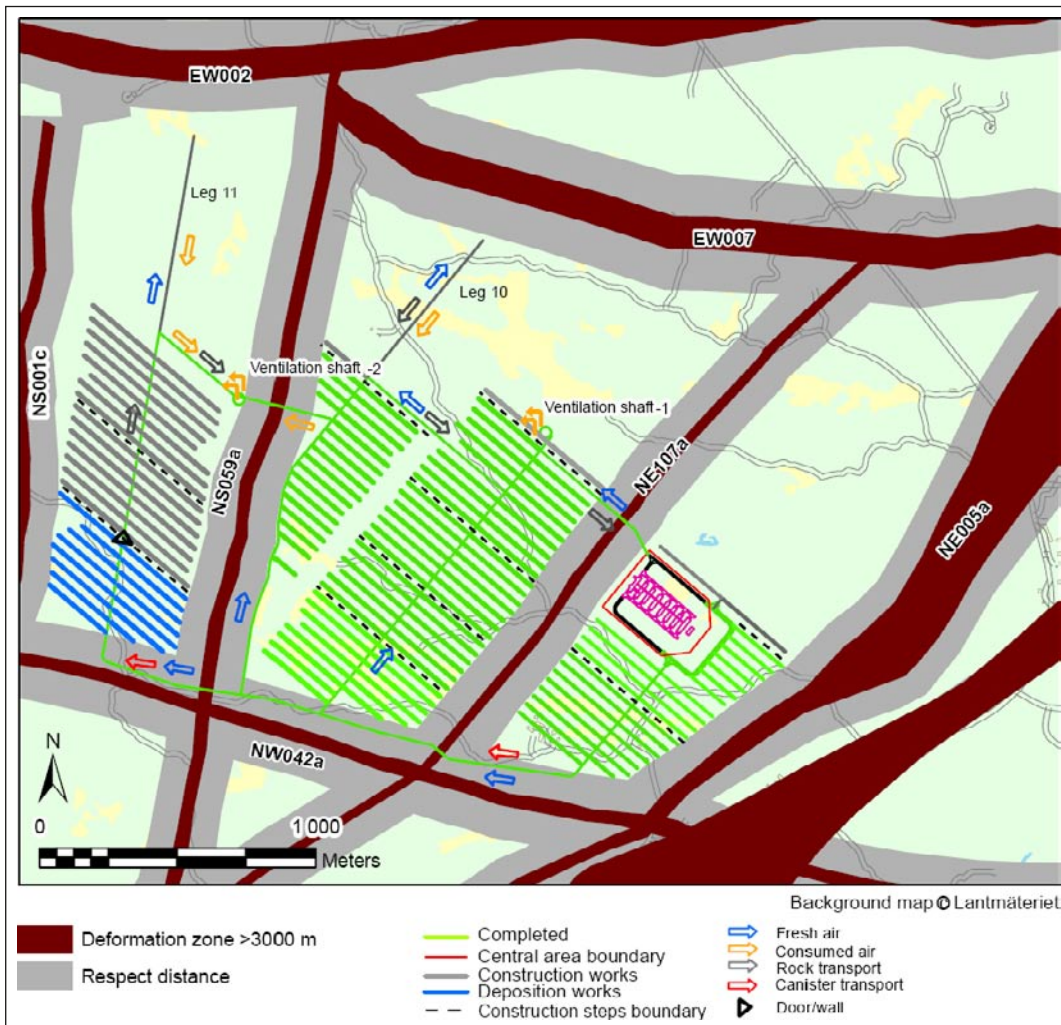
Excavation in leg 10 and 11 and in construction steps 9 and 10 and deposition works in construction step 8.
